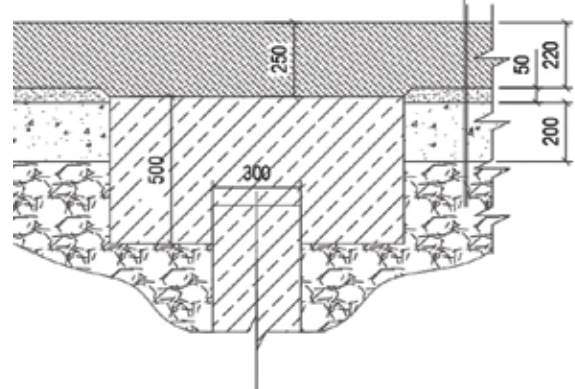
Cross section of floor with pile and circular pile cap (Note: 1 mm = 0.04 in.)
